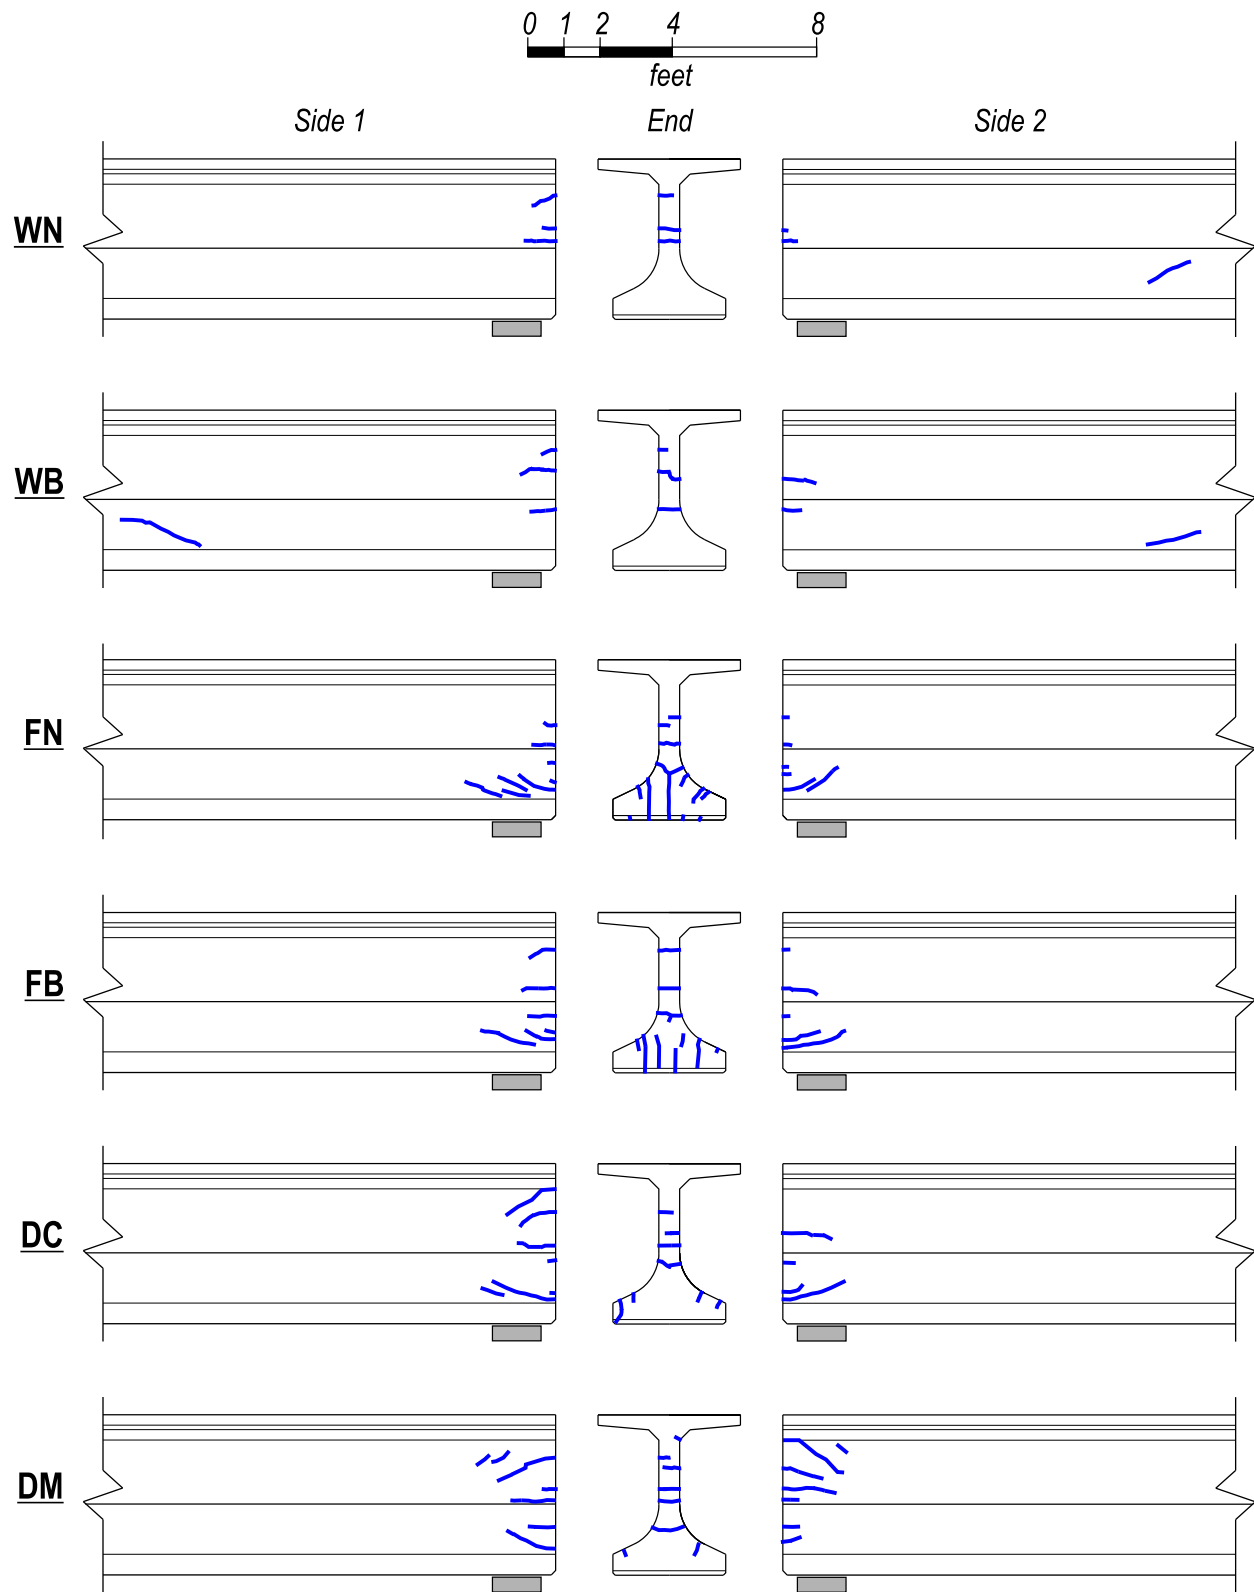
Girders W, F, & D web and flange splitting cracks
